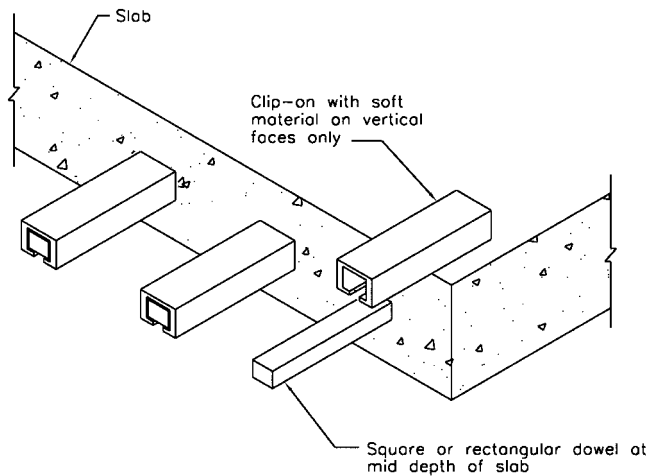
Doweled joint detail for movement parallel and perpendicular to the joint.
